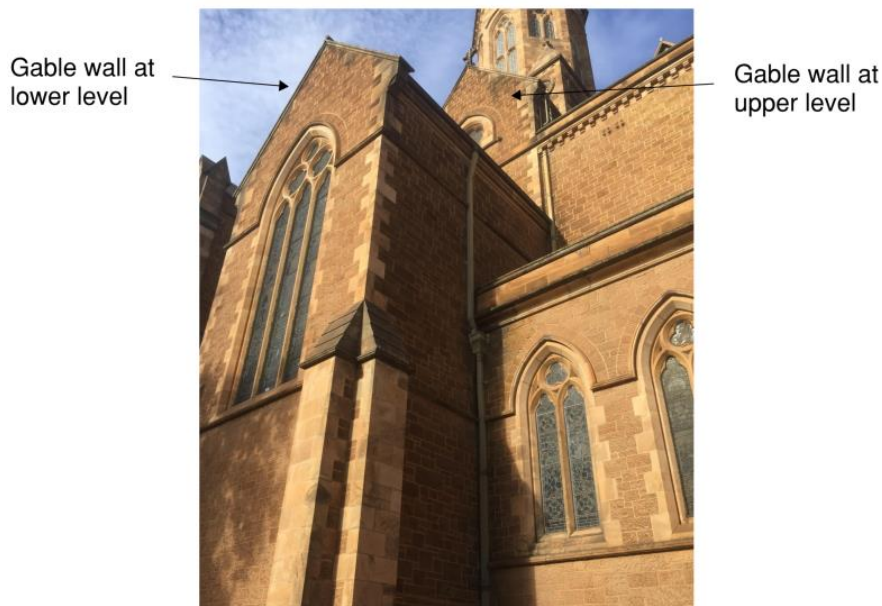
Gable end walls adjacent to the lantern, shown on north-west side.
